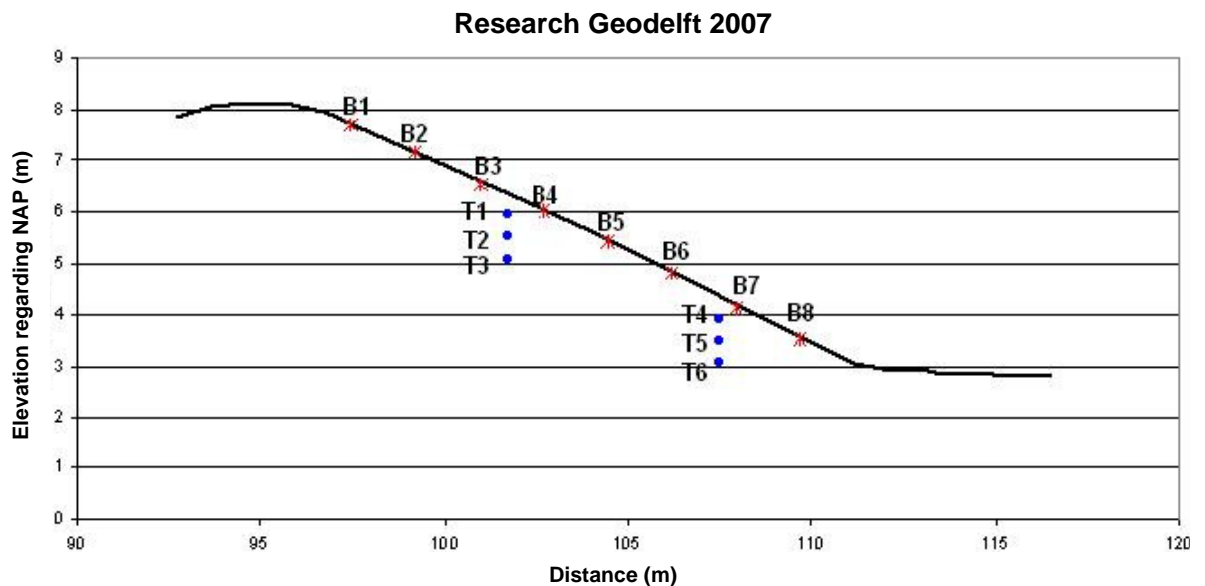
location of the water tension meters (T1 to T6) in the dyke (un-reinforced test section)
